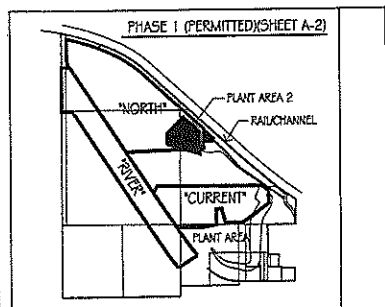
EXHIBIT "A" CABAZON QUARRY REVISED MINING PLAN REVISED PERMIT NO. 5 SMP NO. 162R5
